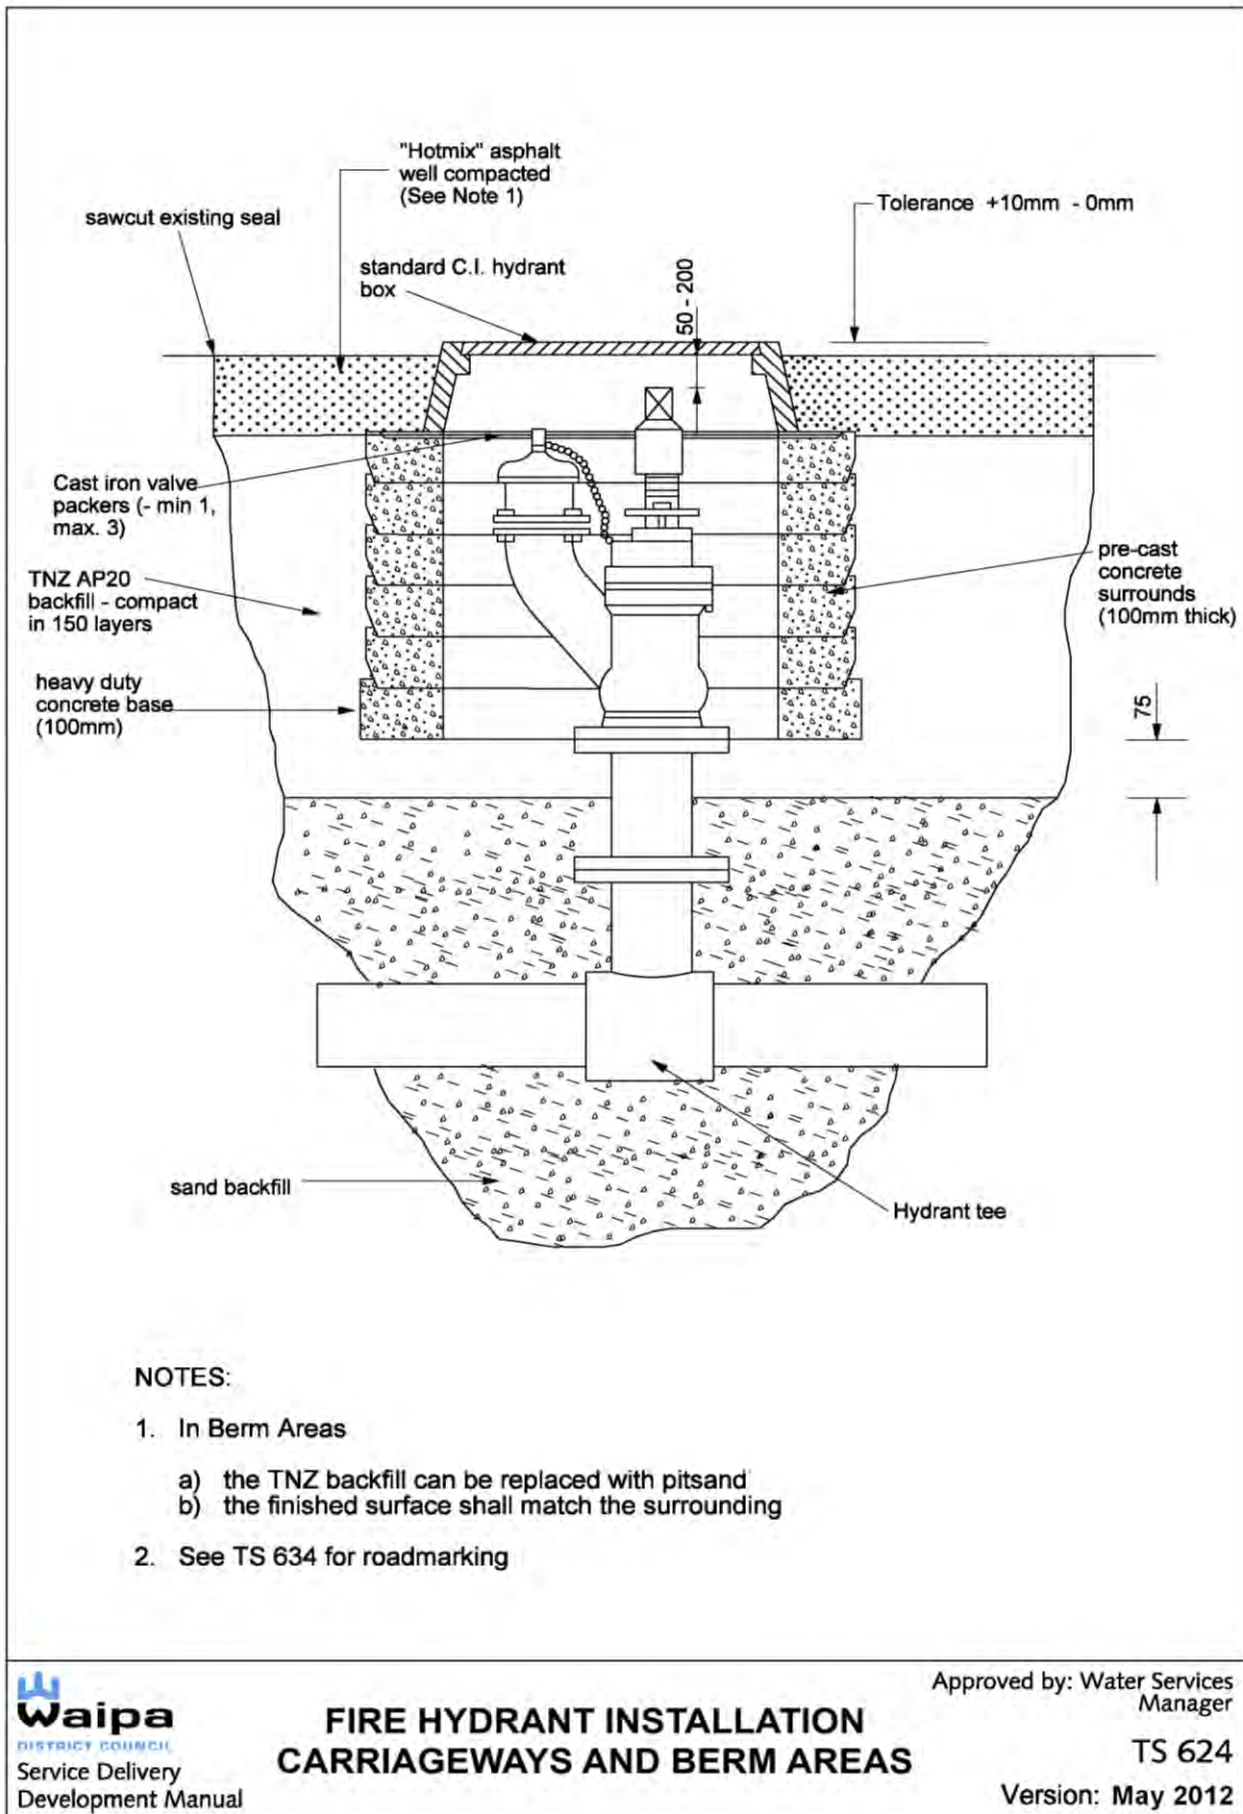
TS 624 Fire hydrant installation carriageways and berm areas
